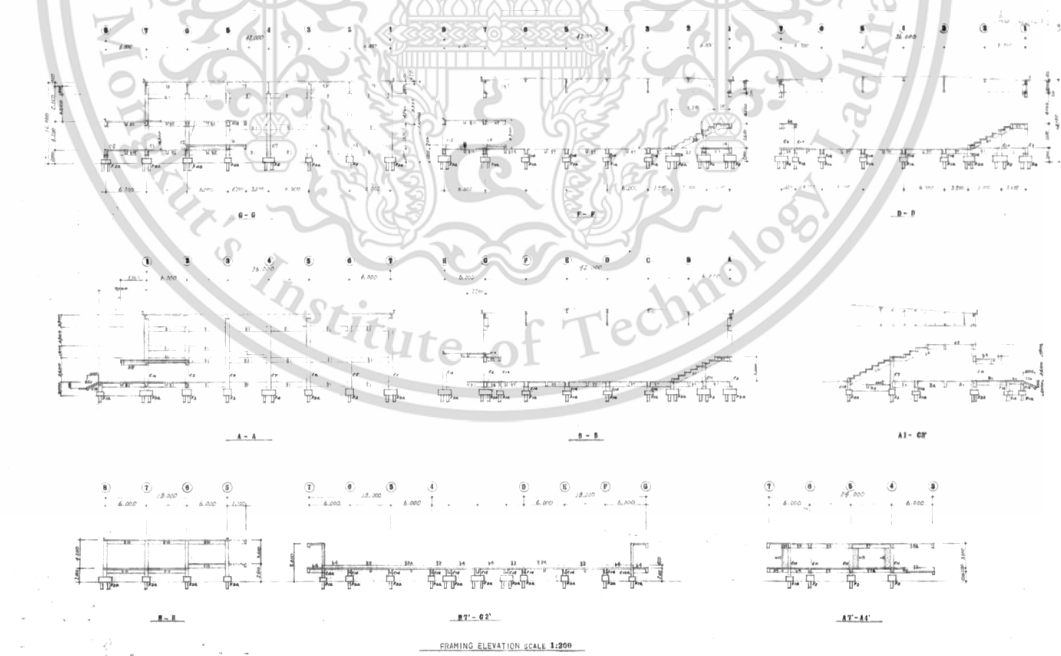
Original drawing of Framing Elevation of First auditorium complex
